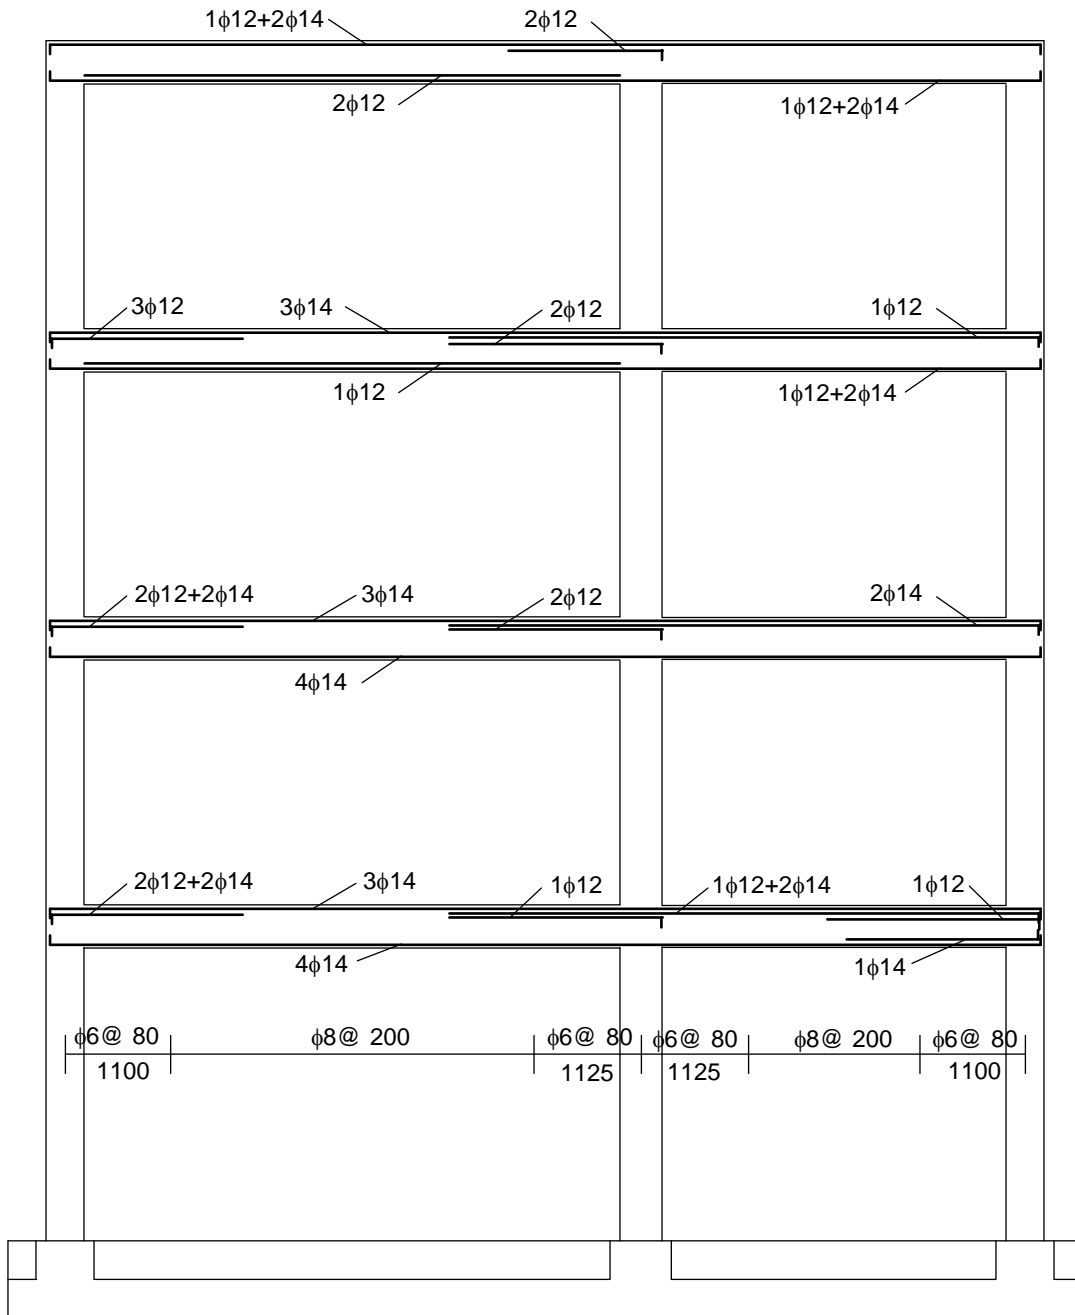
Beam Reinforcement Layout (adapted from 4-14)
